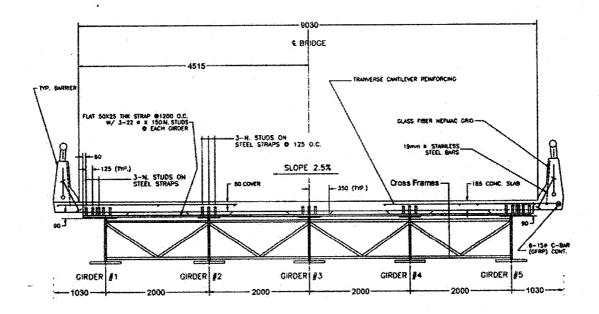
2 Cross Section of Crowchild Bridge (Cheng and Afani, 1999)
